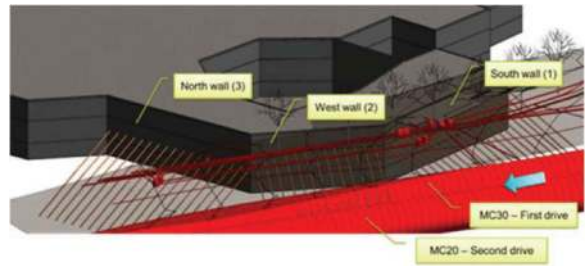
Aotea Centre anchors intersecting the TBM tunnels.
